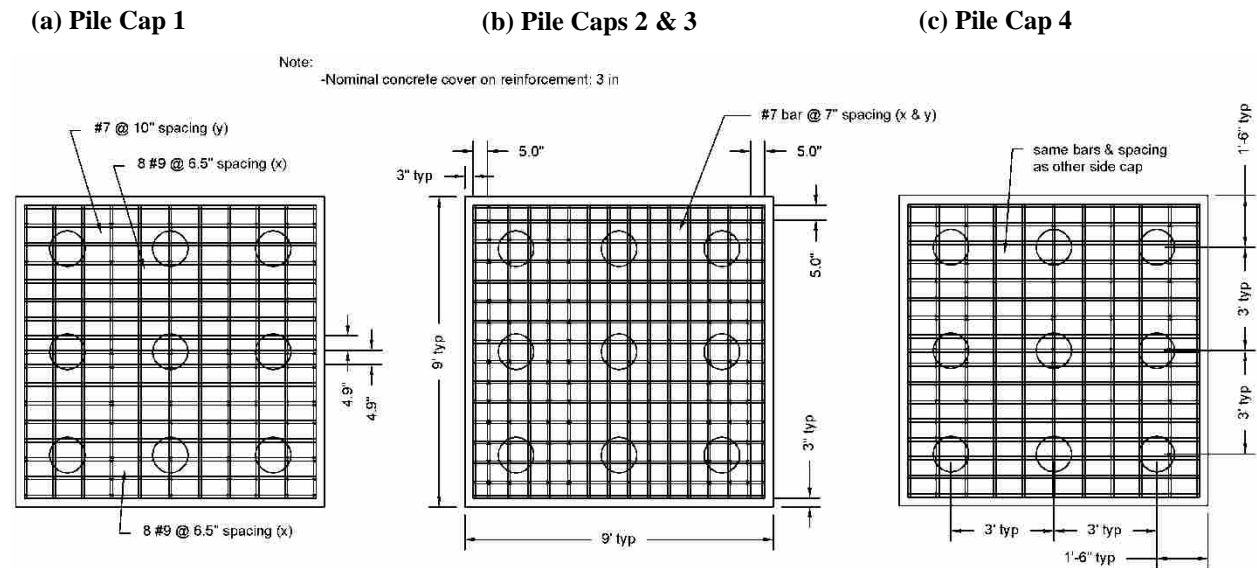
Bottom reinforcing mat layout for the test pile groups
